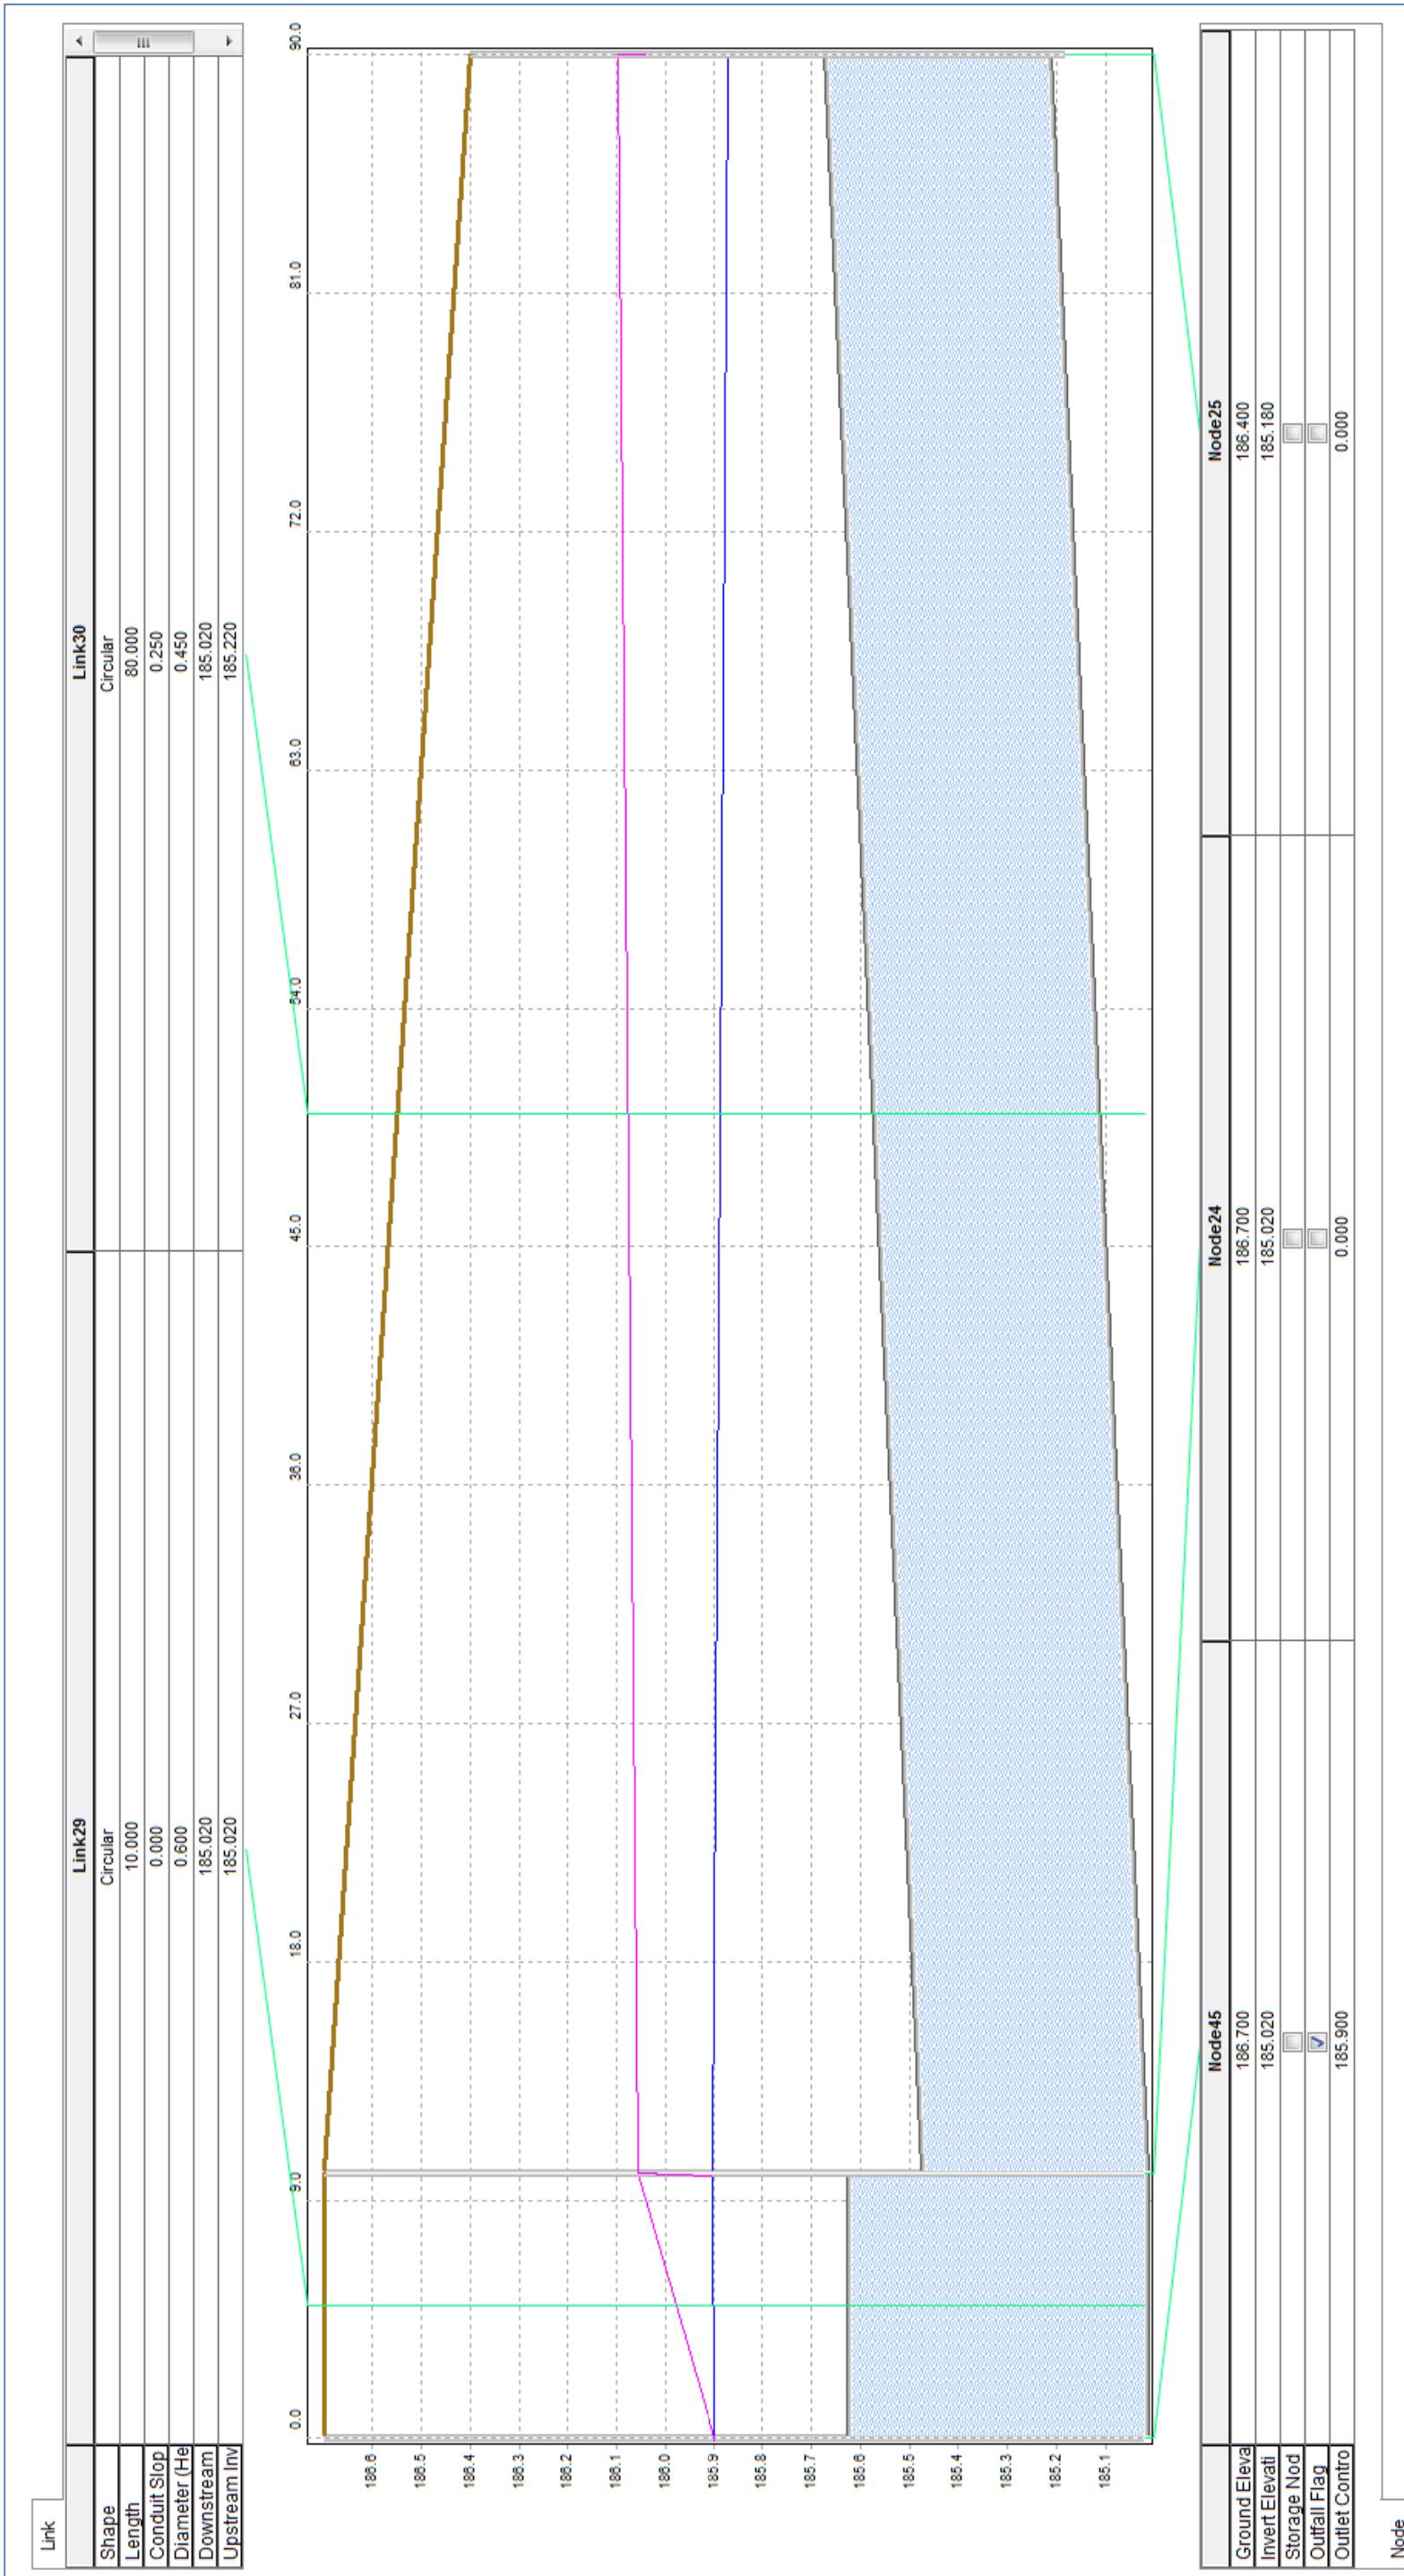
E-W Arterial (Sta. 12+020 - 12+100) - Permanent Pool Elevation + 1.0m Backwater Condition
